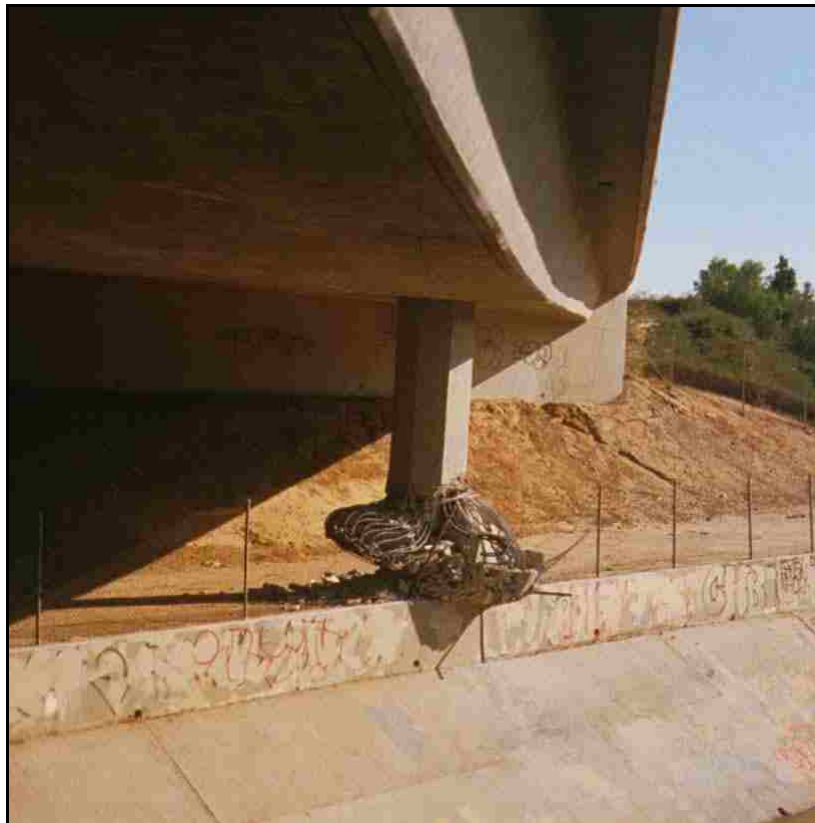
Damage to bridge column caused by post-construction change in boundary condition (Caltrans, 2003)
